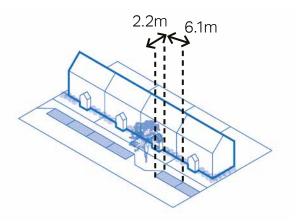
Illustrative diagram showing an indicative layout of on-street parking (metres).
